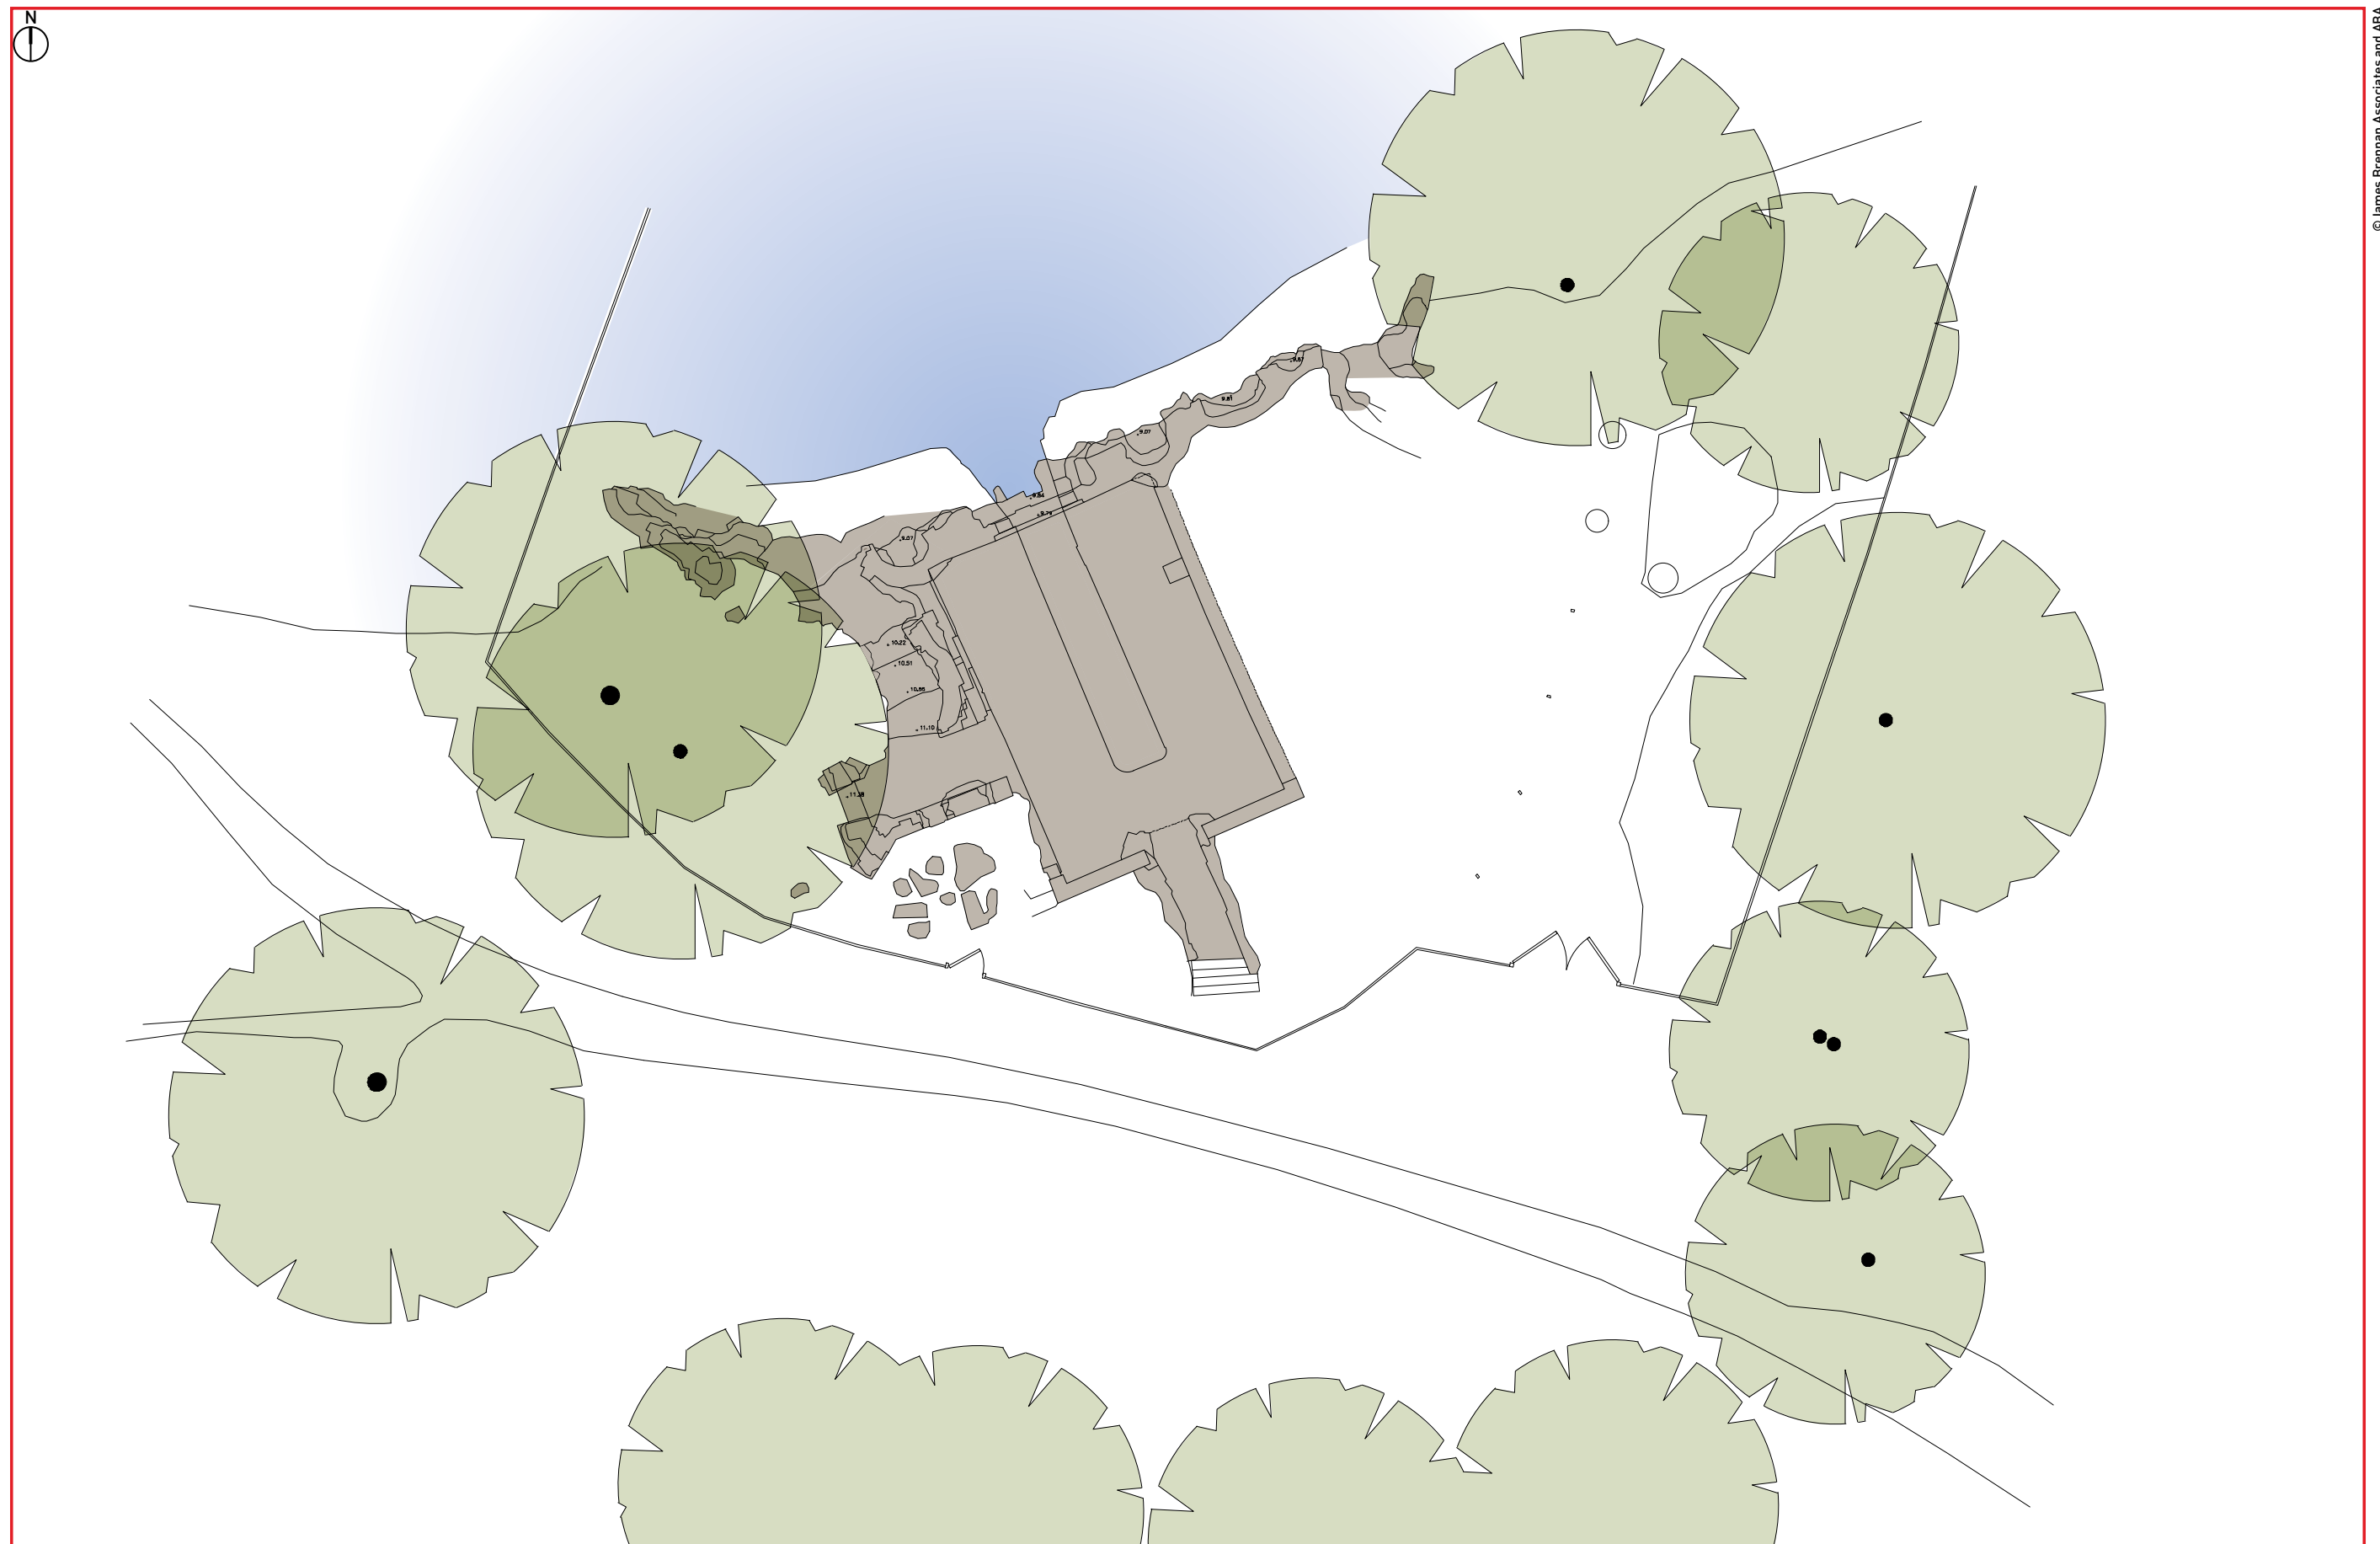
Site plan (red line indicates the site studied as part of the CMP)
